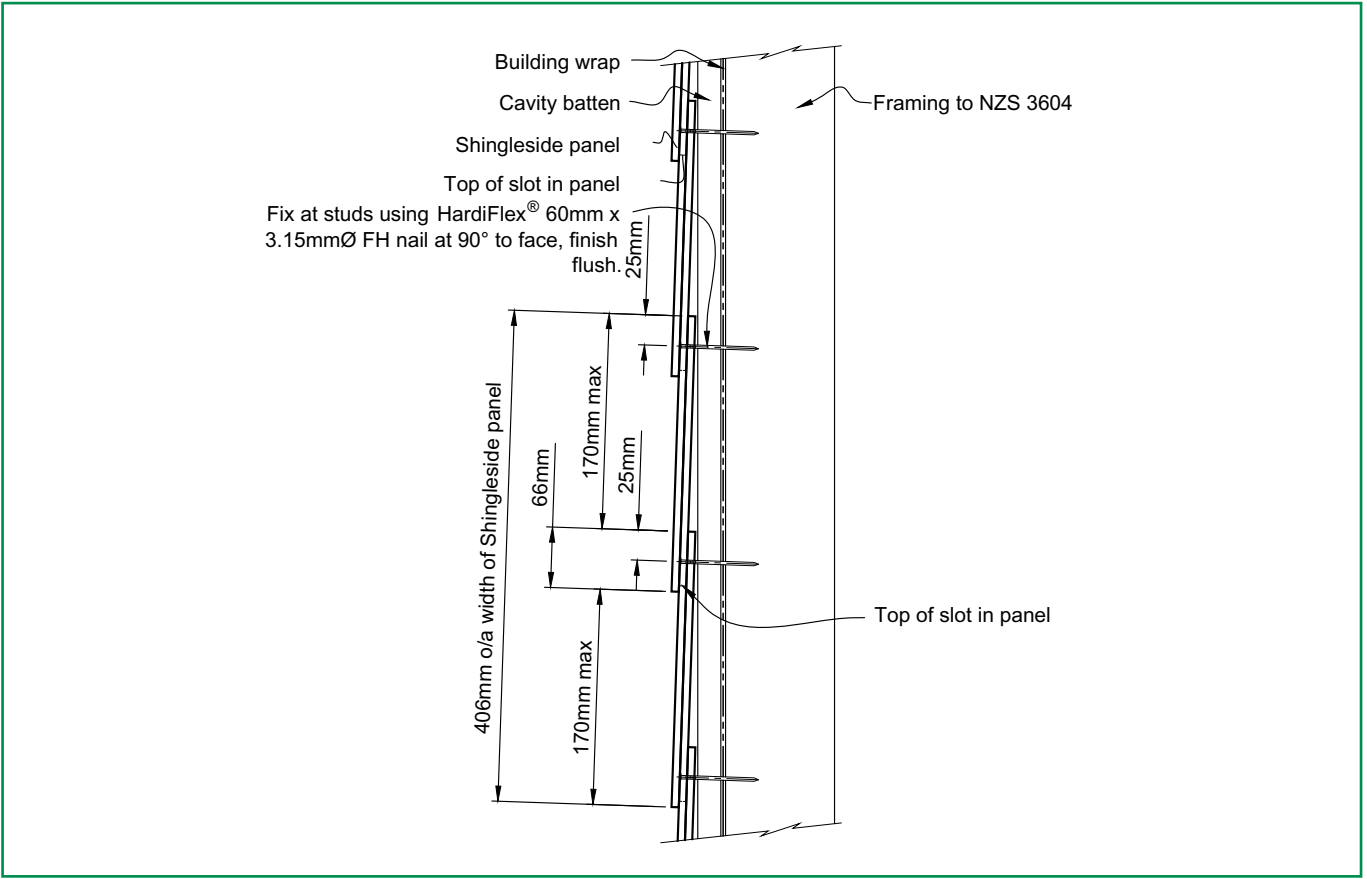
SHINGLESIDE STAGGERED EDGE PANEL FIXING
